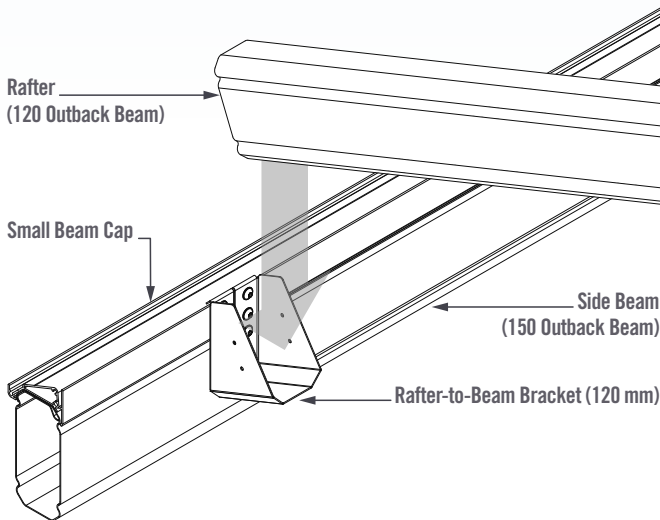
SMALL BEAM CAP - 150 SIDE BEAM - 120 RAFTER
